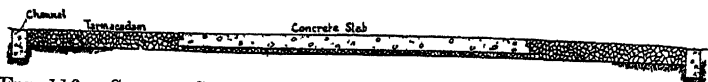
CENTRE STRIP OF CONCRETE WITH MACADAM HAUNCHES ON QUIETER ROADS.
